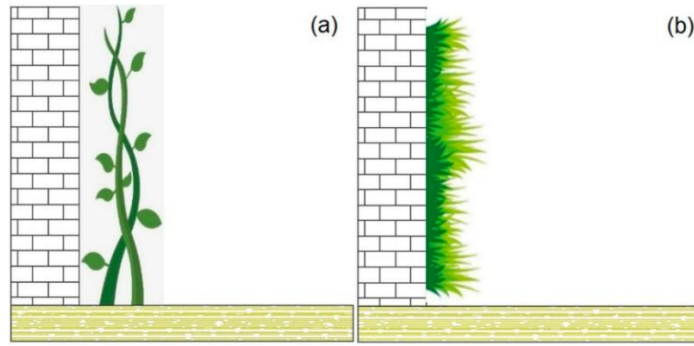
Example of green facade a) and living wall b) (Han et al., 2023)
